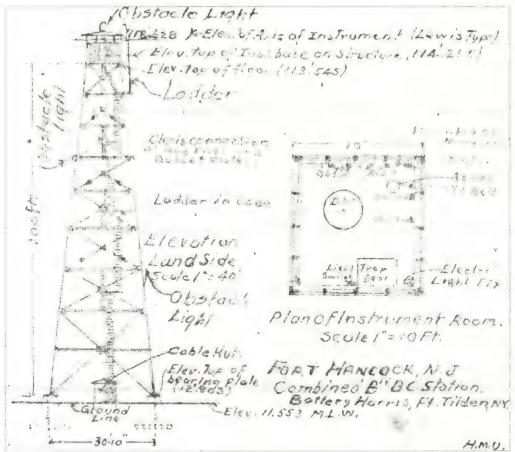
Elevation and plan for fire control station serving Battery Harris, 1927. A 100-foot tall tower was installed approximately 700 feet west of Battery Gunnison to provide fire control for Battery Harris at Fort Tilden (Report of Completed Works, CDSG ePress).
